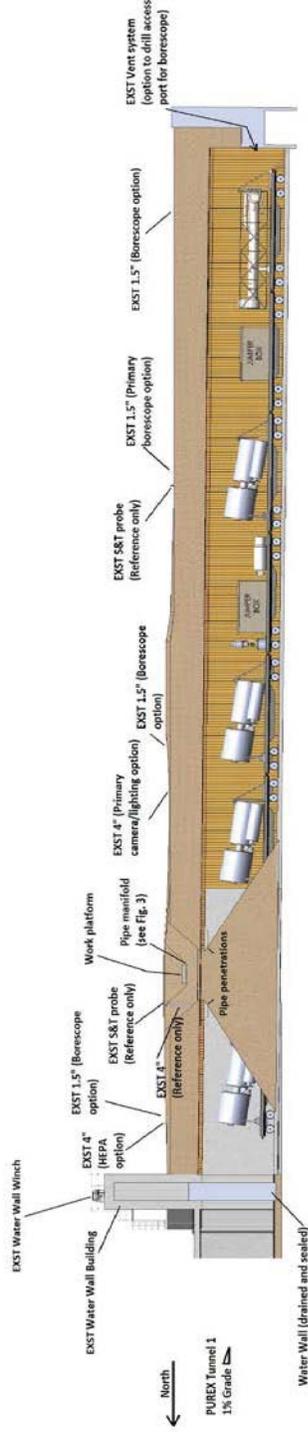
West Elevation of Tunnel Number 1 with Equipment Placement
